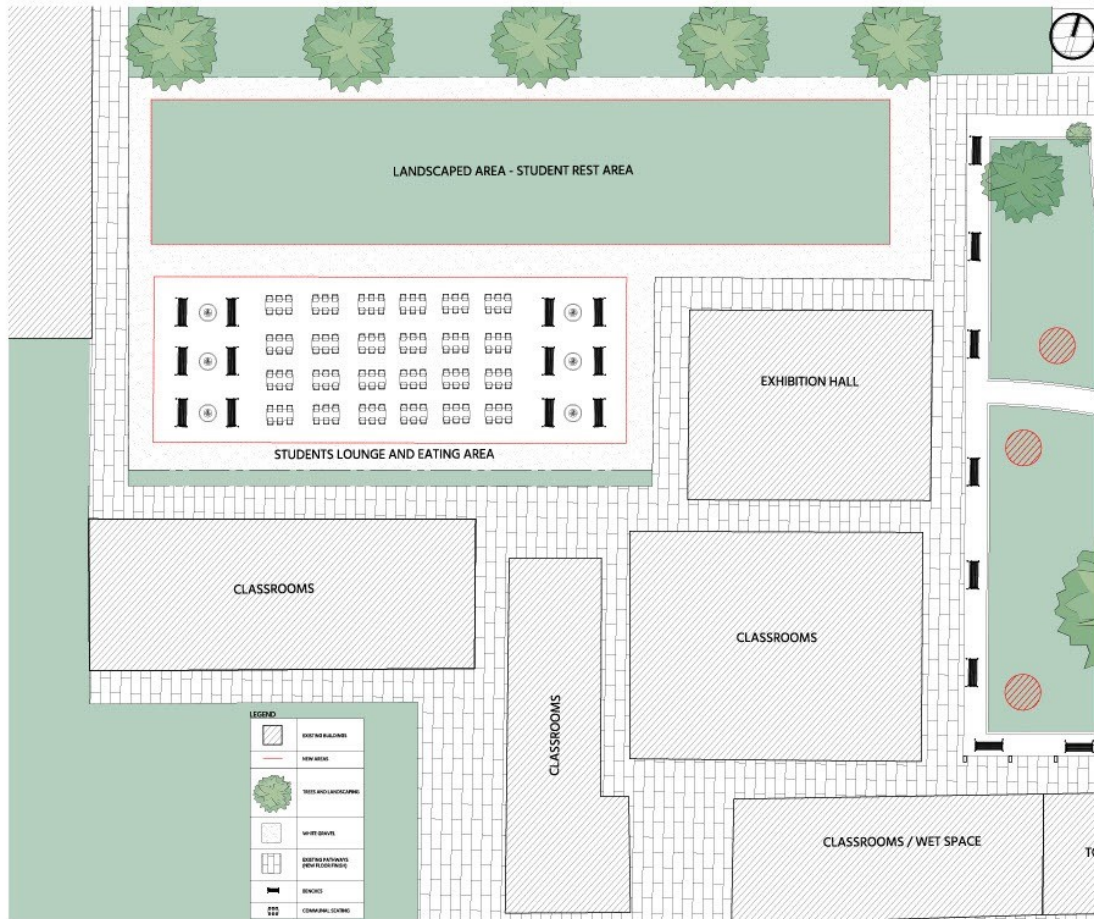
Blown Up Image of Site Plan of DCFA'S Front Entrance with Design Interventions
